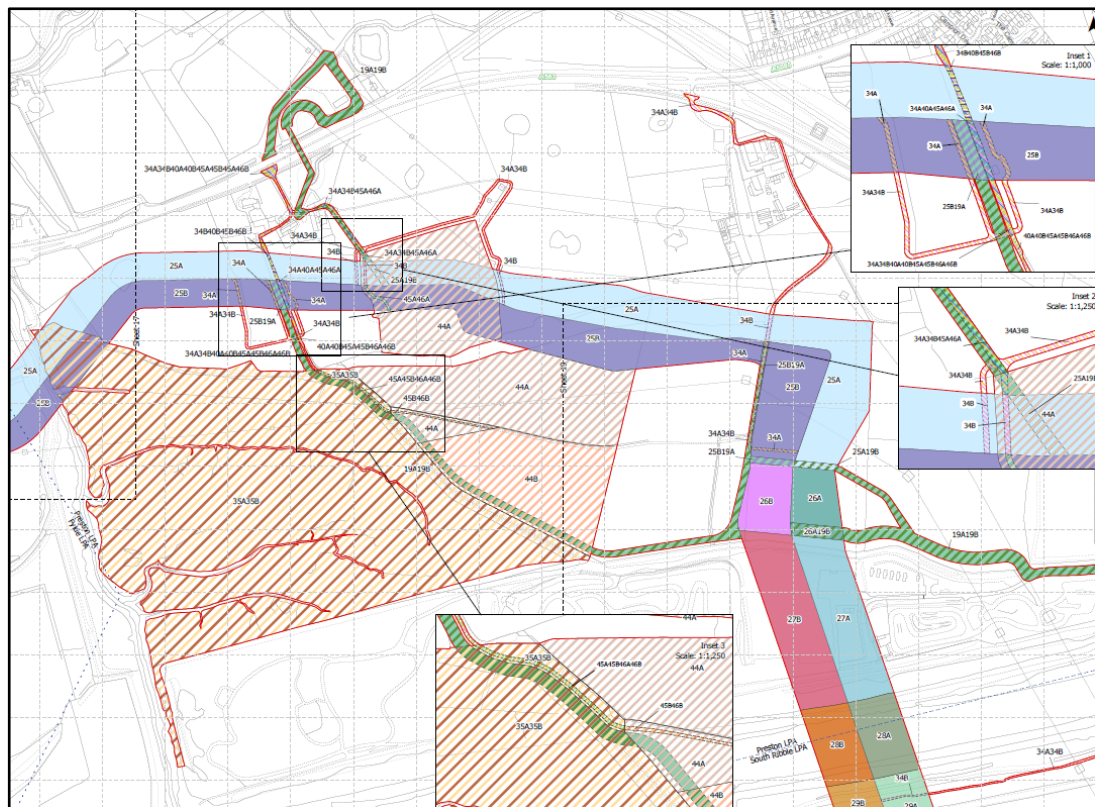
extract of Works Plan – Sheet 18 of 21, Works Plans Part 2, Drawing. No. BP-GBR-MORG-REG-0175
